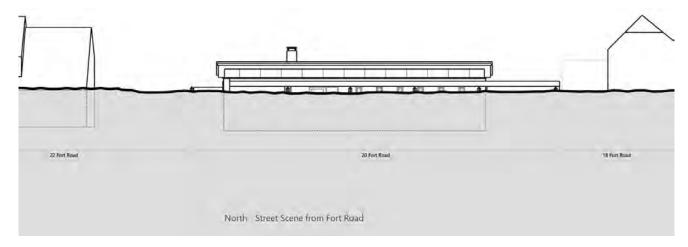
Proposed street elevation when viewed from Fort Road (NTS)
